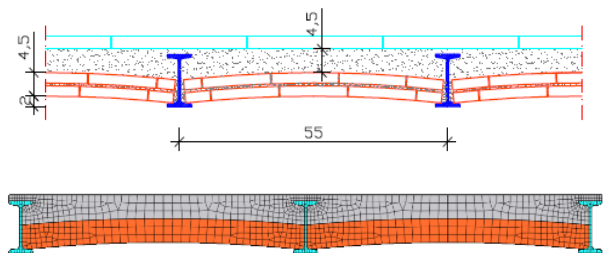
Flexible diaphragm system of tile vaults with steel beams
